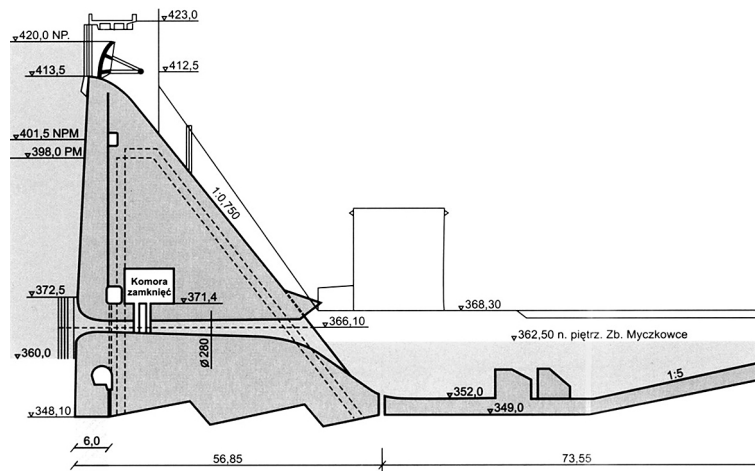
Cross-section of the Solina dam (spillways and bottom outlets) (Kozicki, 2011)
